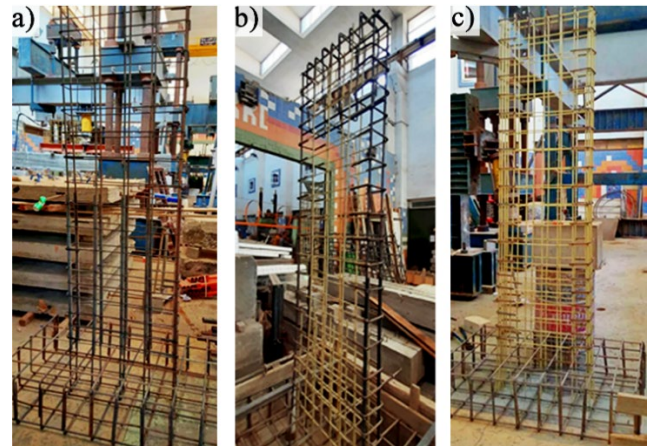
Reinforcement configuration of (a) steel, (b) hybrid steel-GFRP, and (c) GFRP reinforced walls
